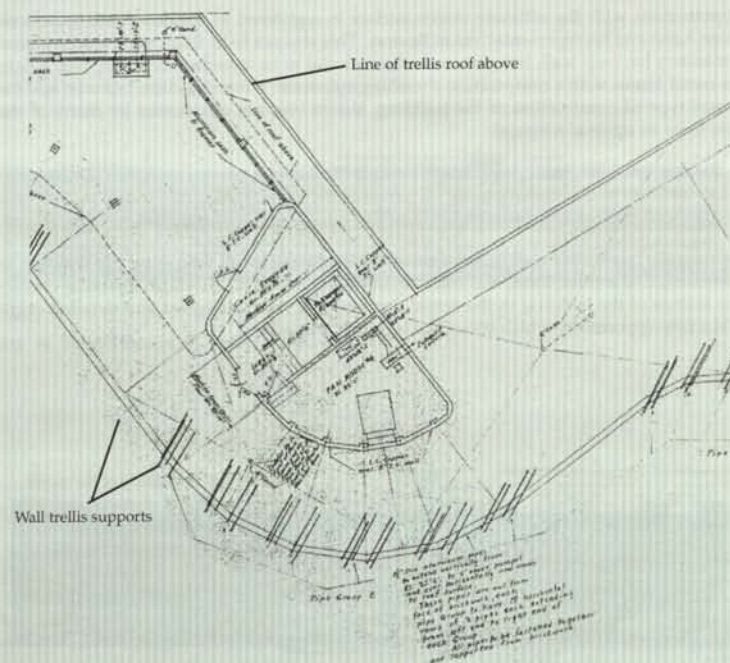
Detail of PS&H/Aalto roof plan - showing roof and wall trellis (10/2/47)
